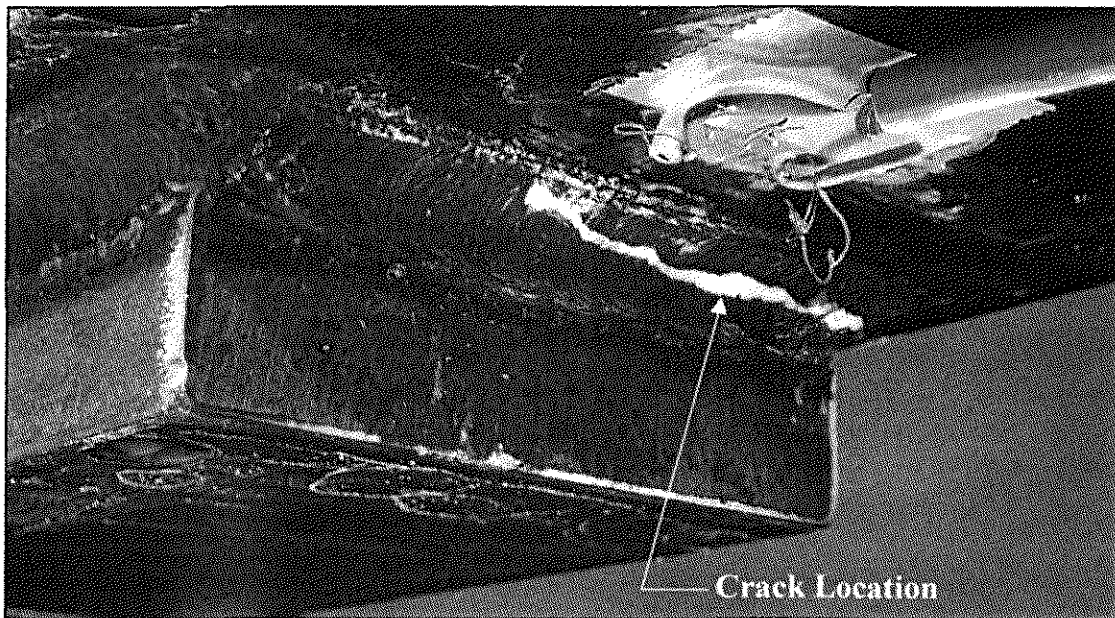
Weld throat crack on a specimen treated with UIT.
